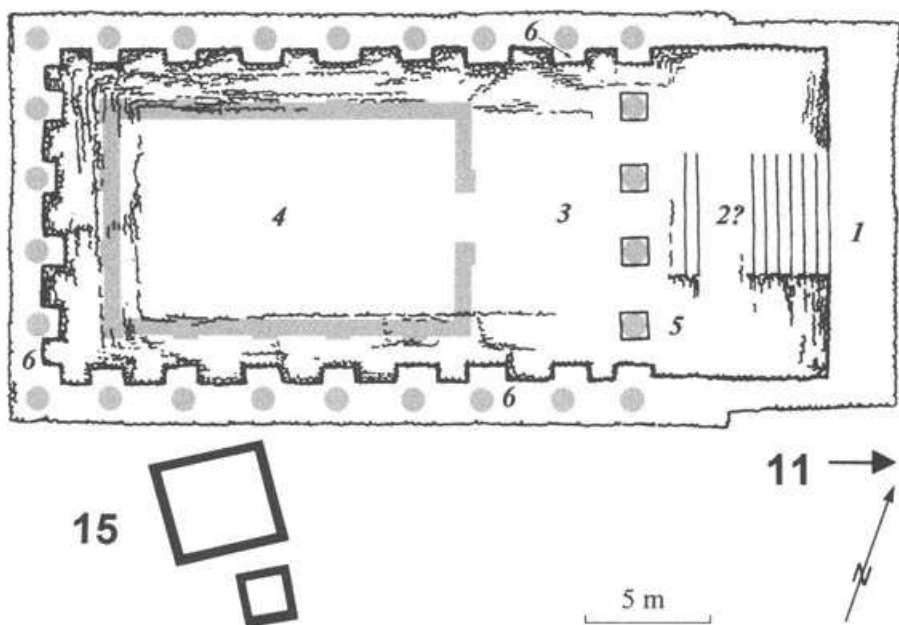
Temple complex on Schönbühl Hill 16. Ground plan of the surviving foundations of the temple. Grey: position of columns and sanctuary (*cella*) wall (conjectural). Scale 1:300.
